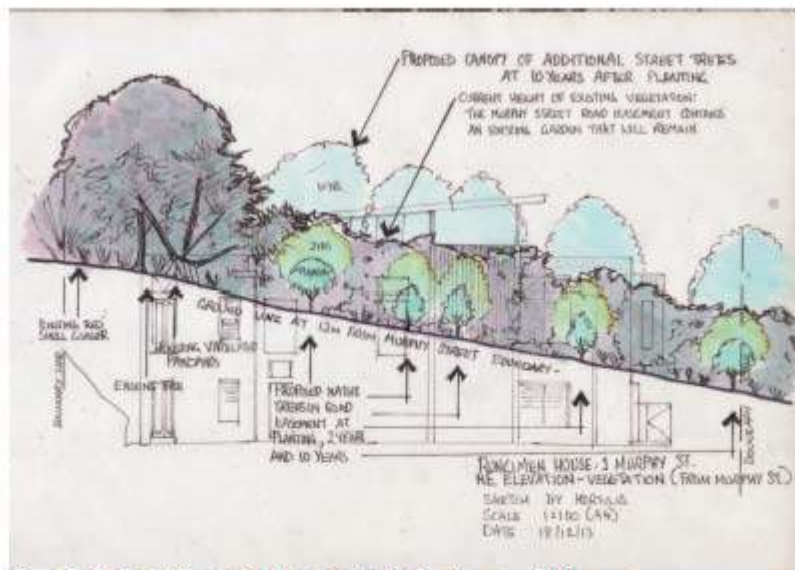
North East Vegetation Elevation at planting, 2 years and 10 years.
